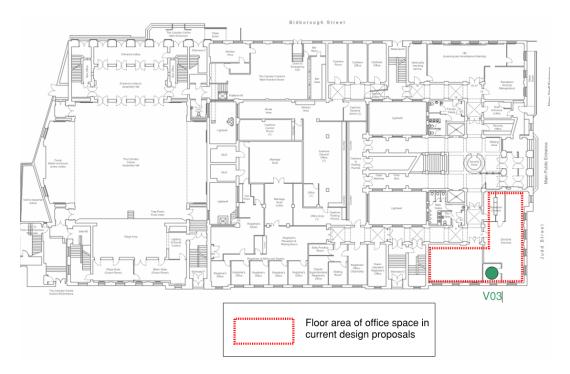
Vibration measurement locations at Ground Floor level in the existing building
